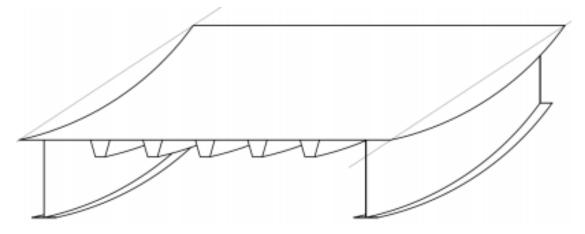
Structural system 7 (Håkansson & Wallerman, 2015)
